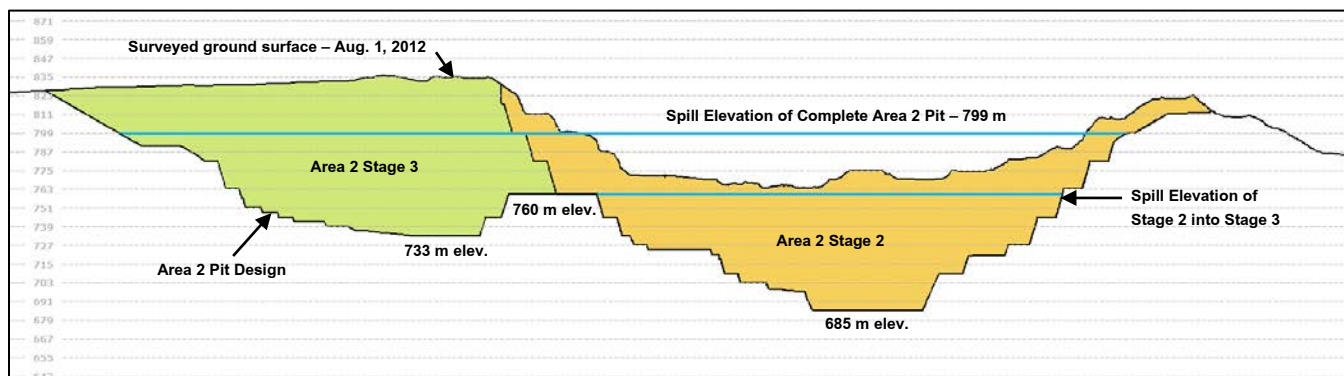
Section looking NW through Area 2 Pit showing staging and spill elevations.
